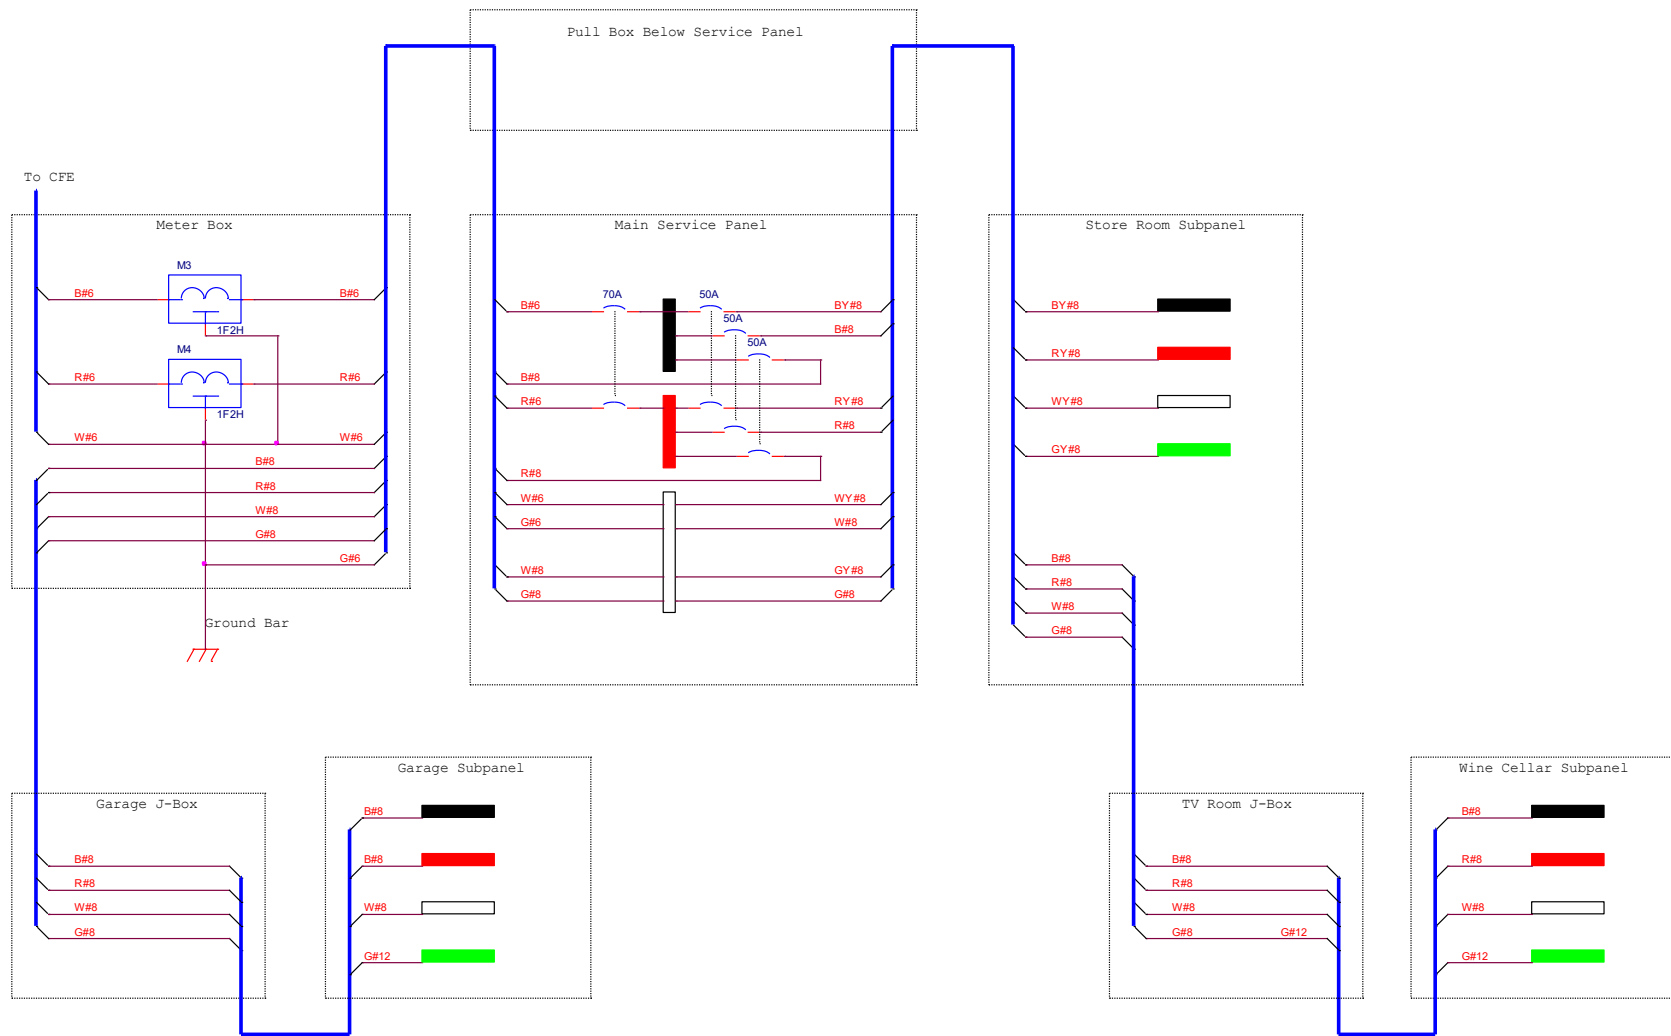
New Wiring of Meters and Panels at Colibrí
